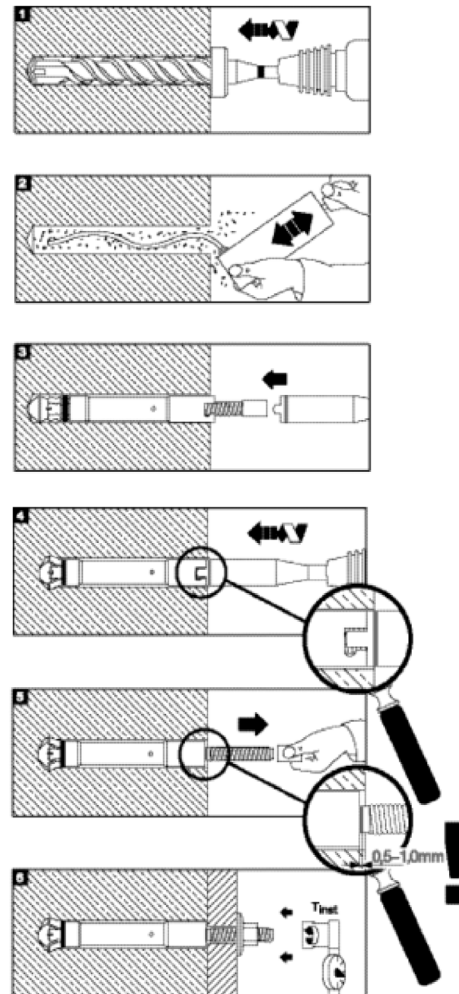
Installation of an undercut anchor of the type shown in Fig. 2.25c
